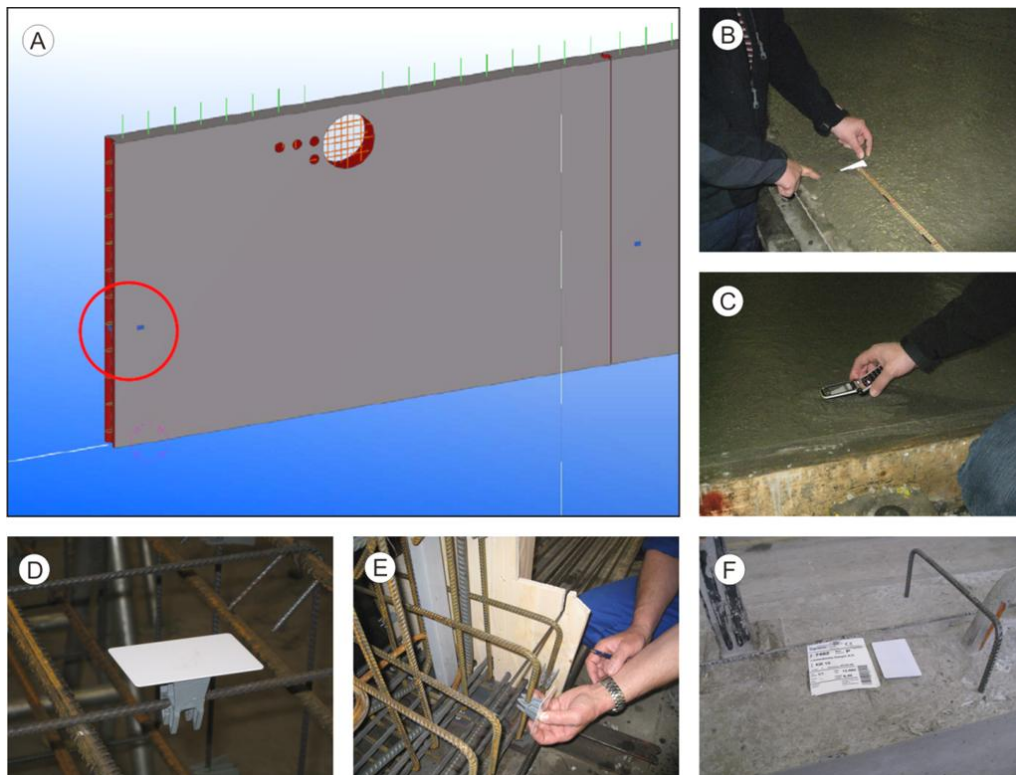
Screen dump and photos from experiments with embedding RFID tags in precast concrete elements.
